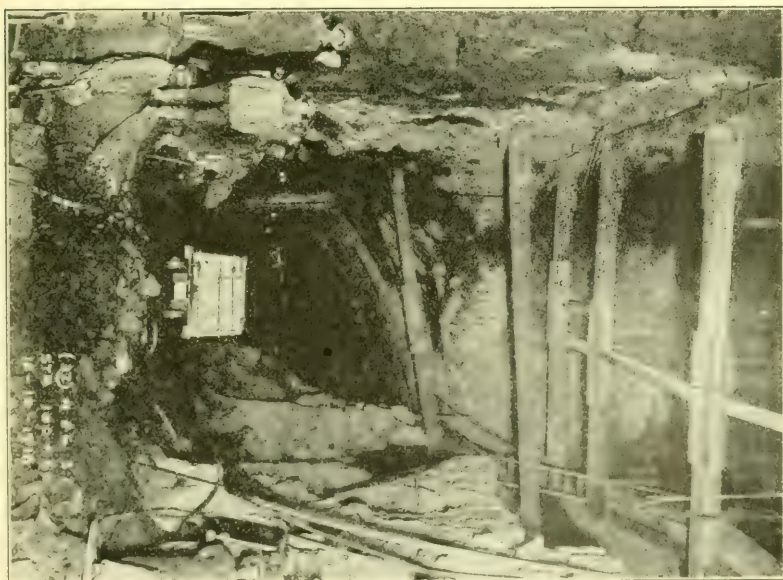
NEW STATION ARCH OF QUEENSBORO TUNNEL, LOOKING EAST.
